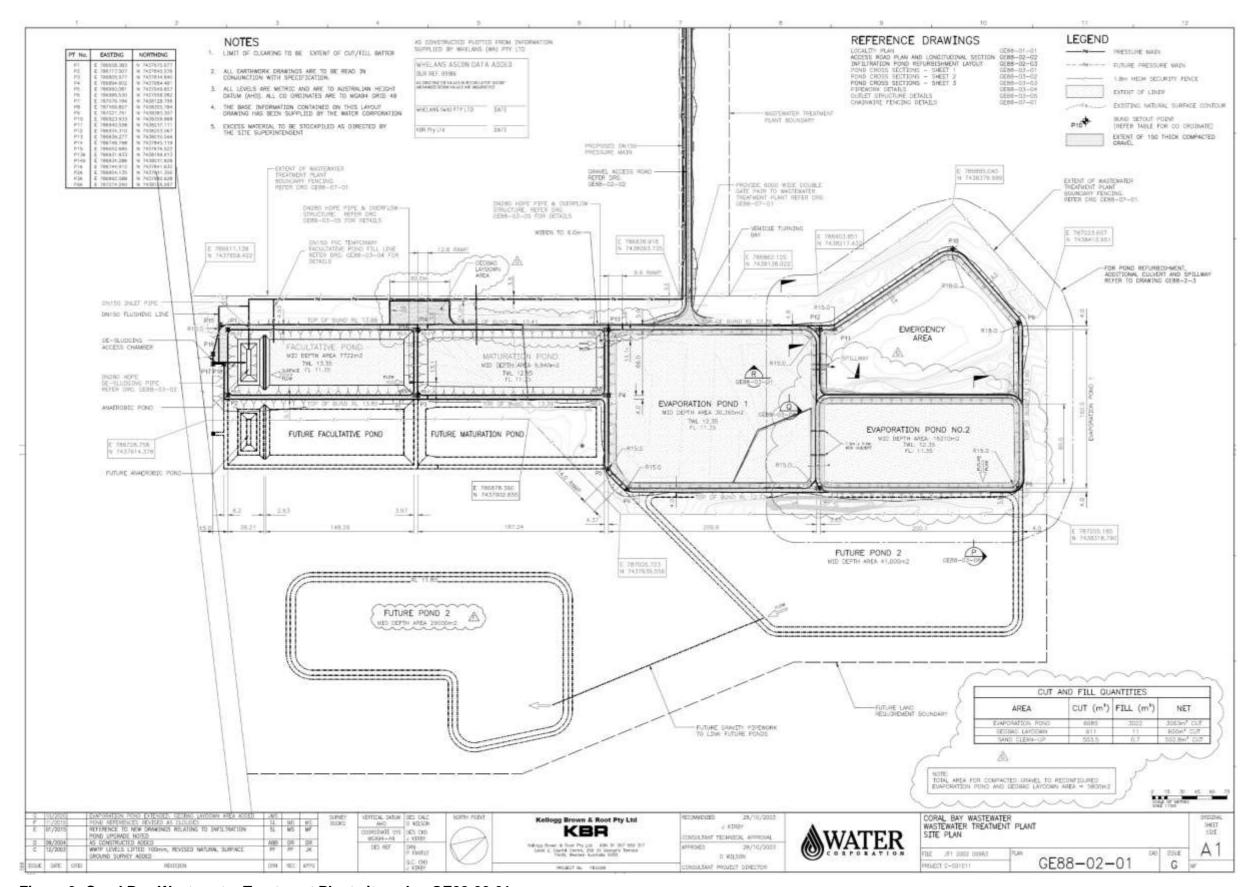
Coral Bay Wastewater Treatment Plant site - plan GE88-02-01
